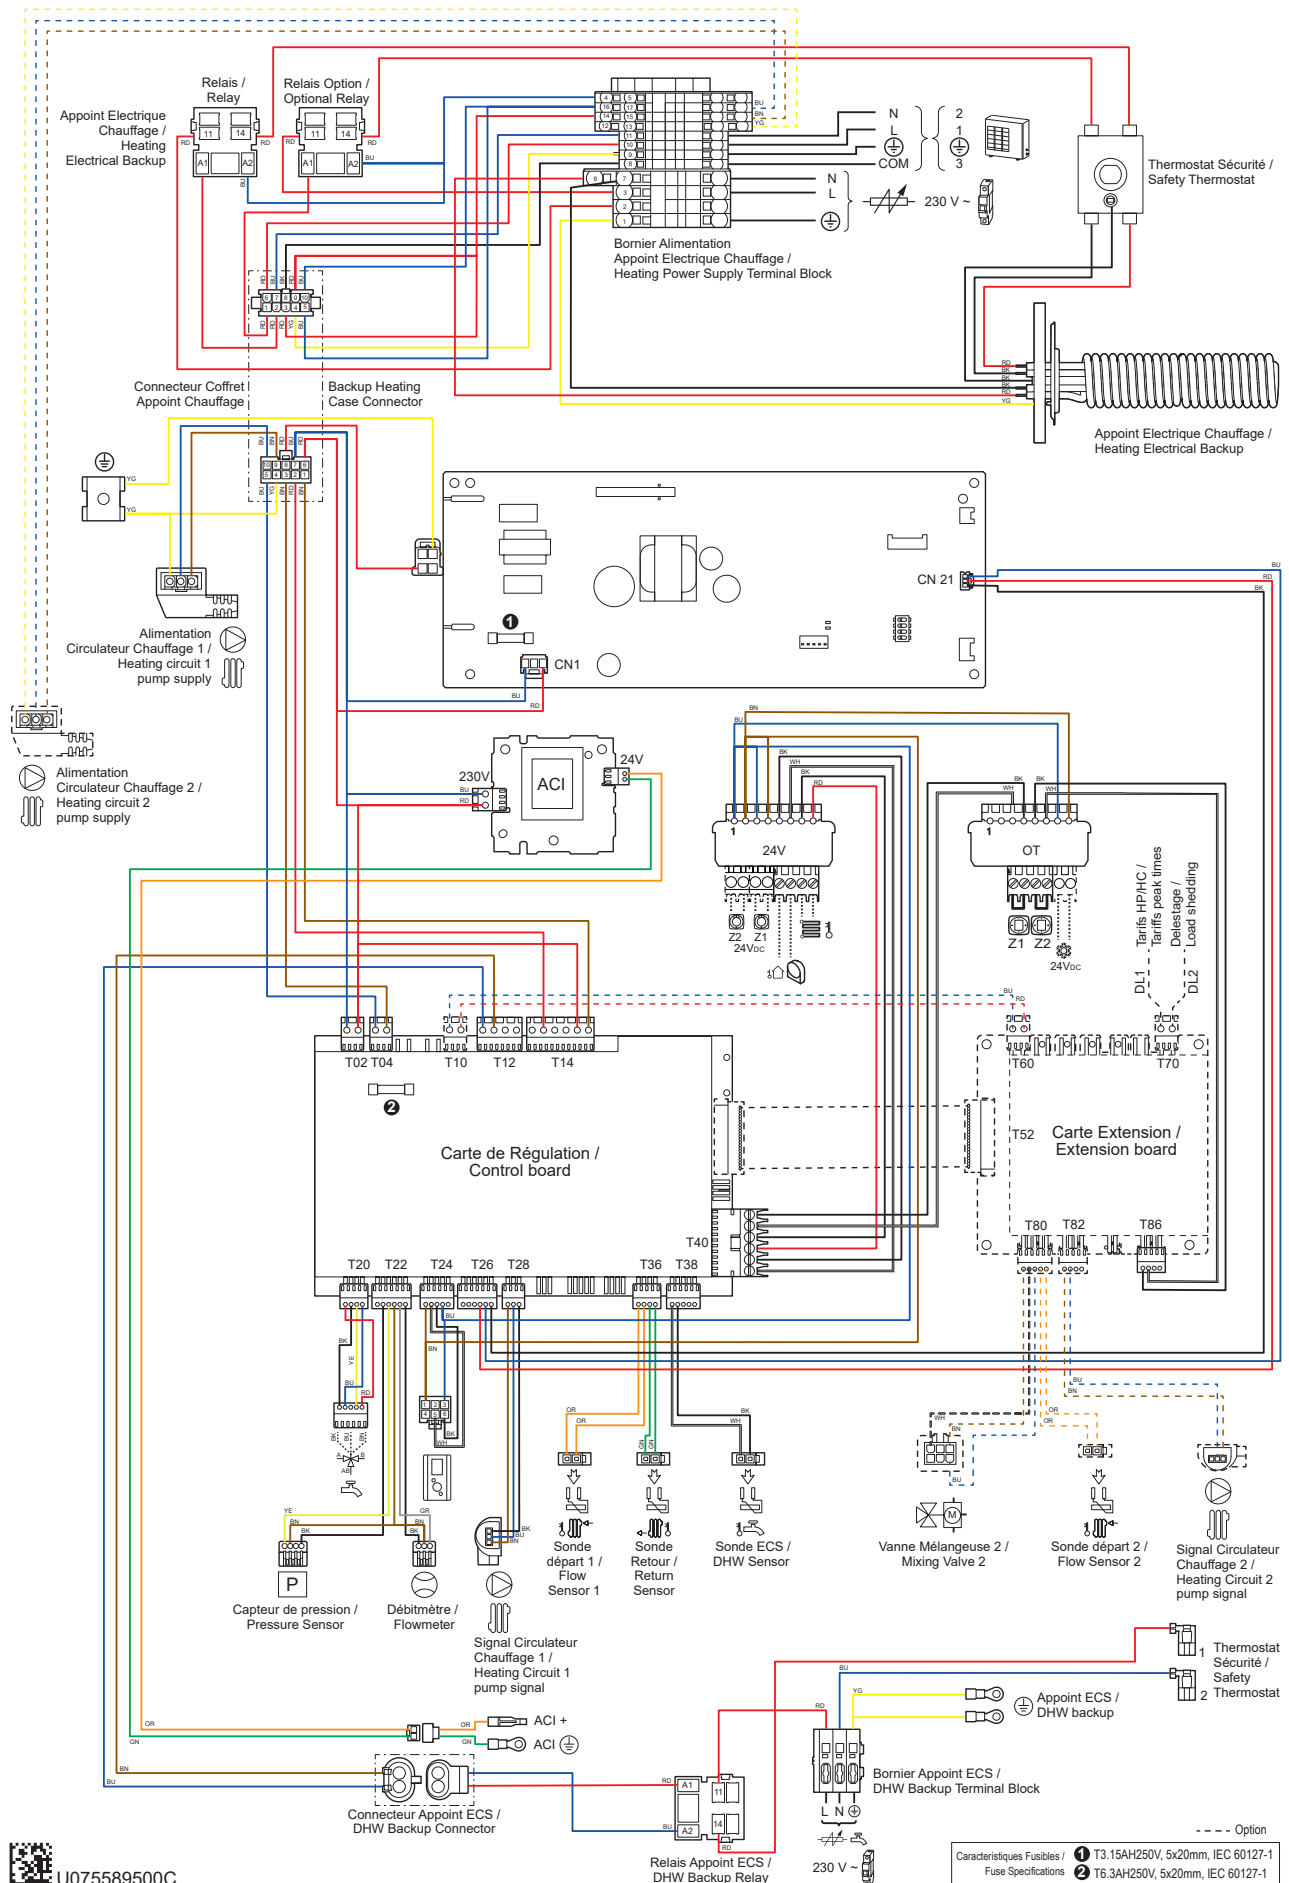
Electrical wiring Hydraulic module (excluding installer connections)
